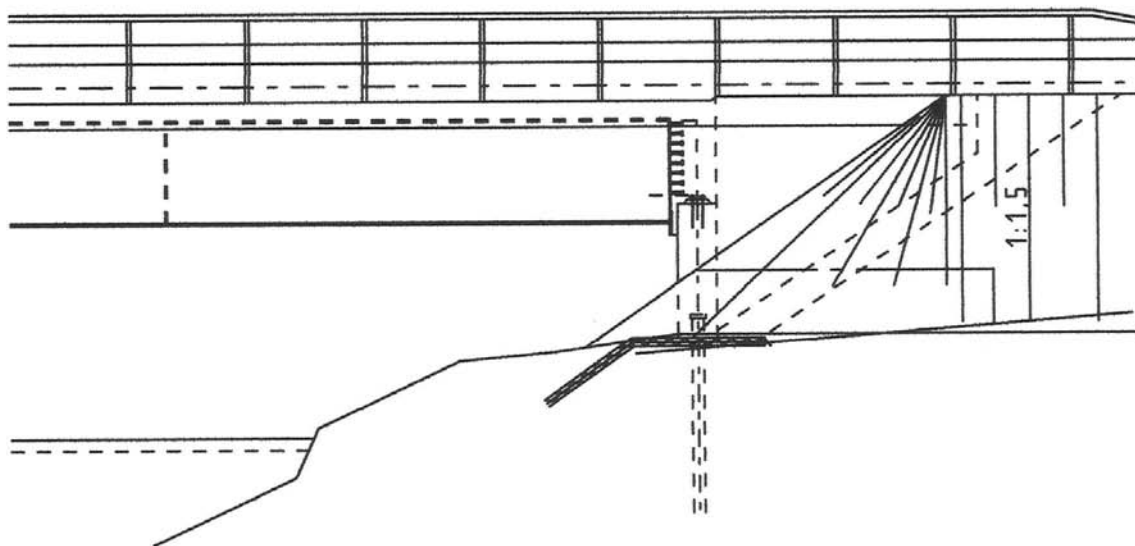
Elevation of the bridge shown in Figure 3-5, where the steel piles are positioned in a straight line.
